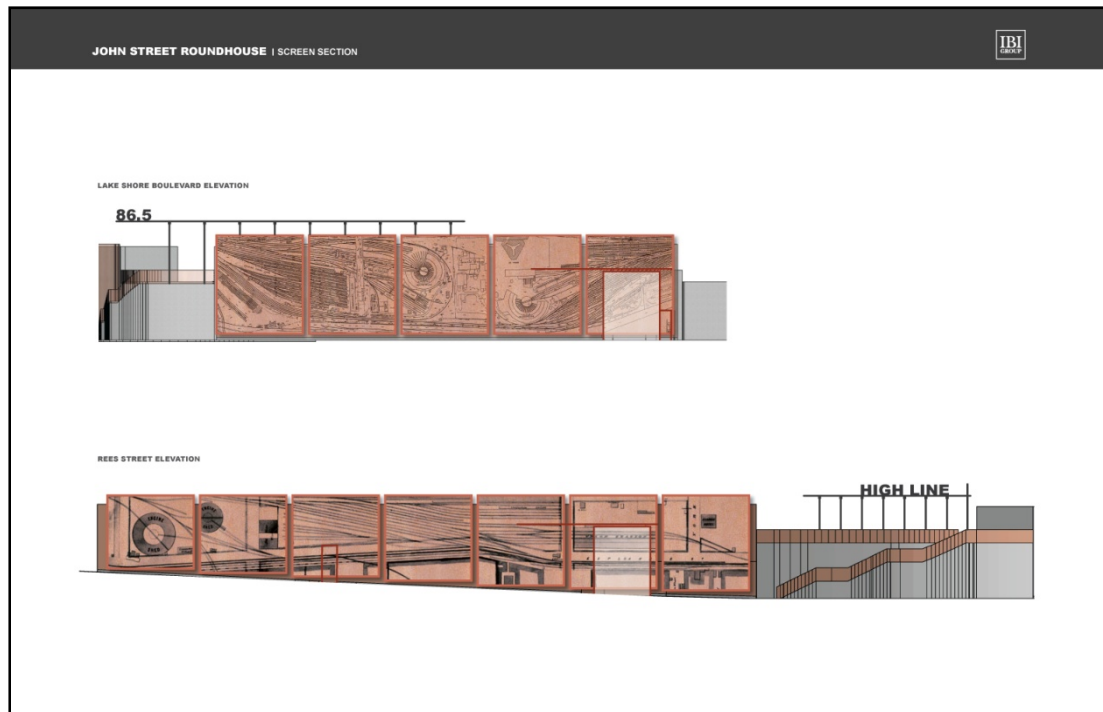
Elevation Layout of Bremner TS Site; View from Lakeshore Blvd (top) and Rees St (bottom)
